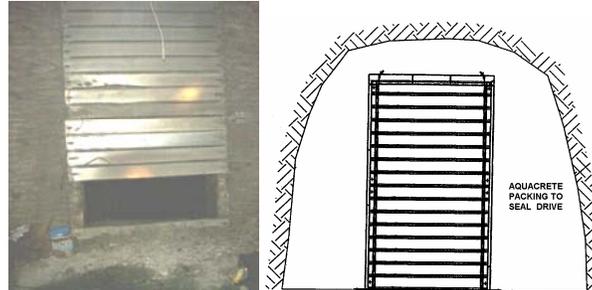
Photographic views and engineering drawing of a half size C-section regulator.
